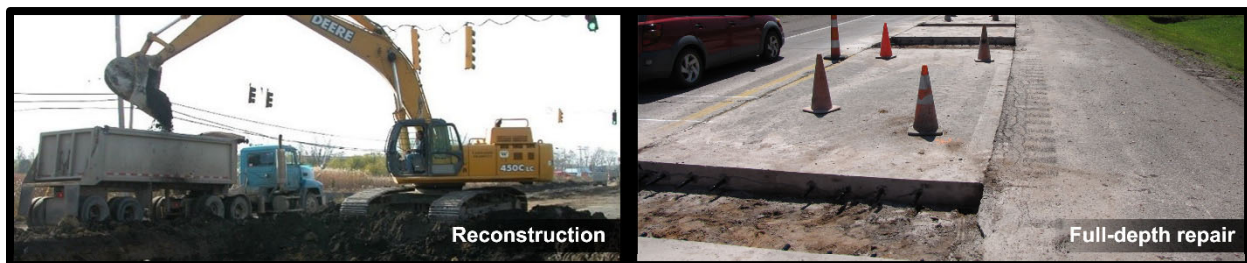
Examples of reconstruction treatments—(left) reconstructing a road and (right) road prepared for full-depth repair.
